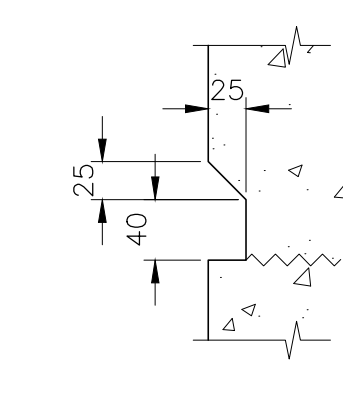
DETAIL - APPROACH SLAB EDGE ANGLE (2/S3)
